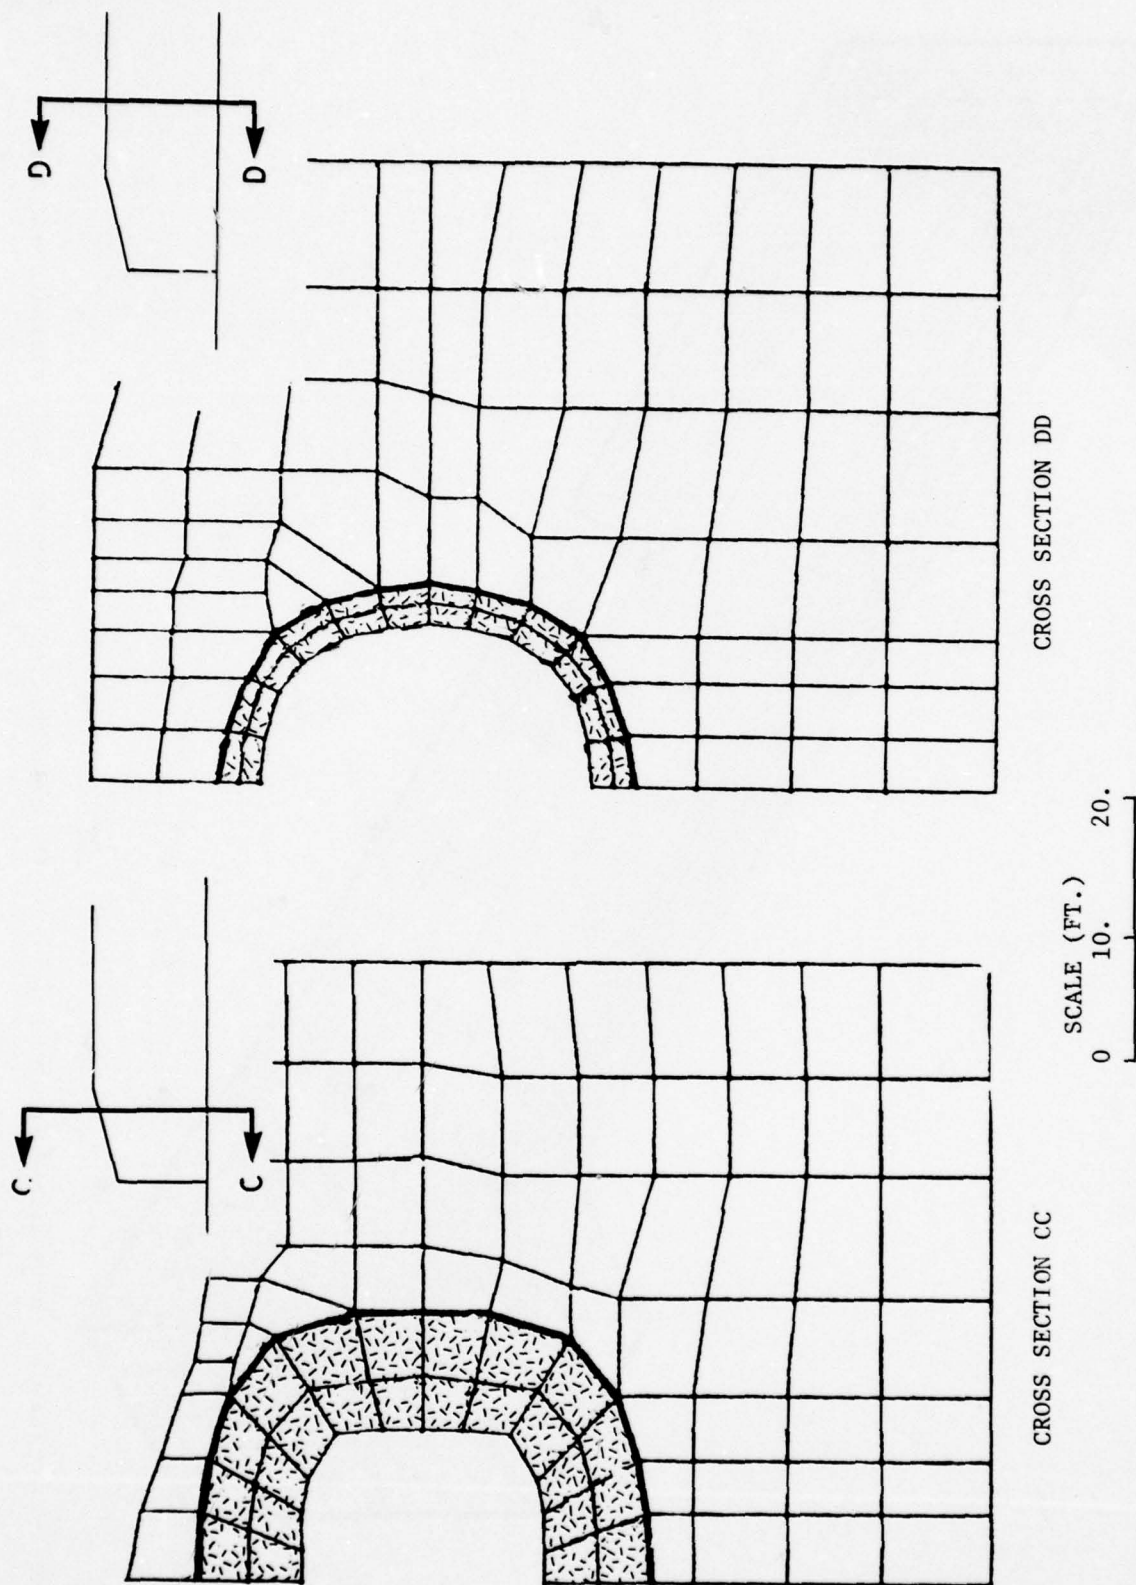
Cross-sectional view of three-dimensional model, transition section and tube
